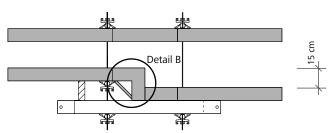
Clamped in place using Uni-assembly lock 22
